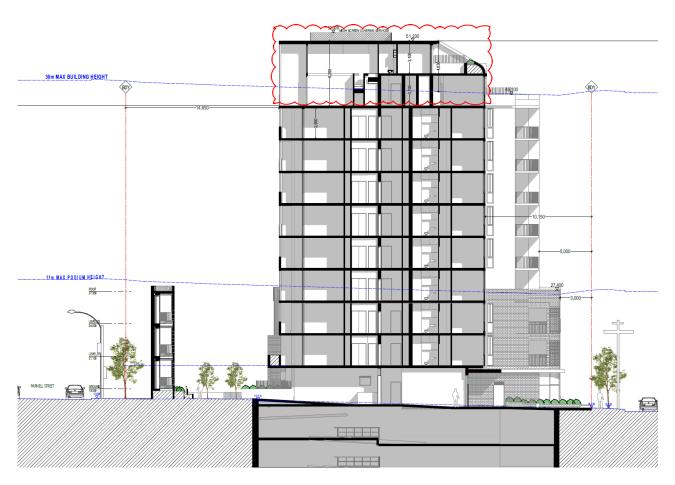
Extract from submitted plans – Dwg DA-302 Section BB
